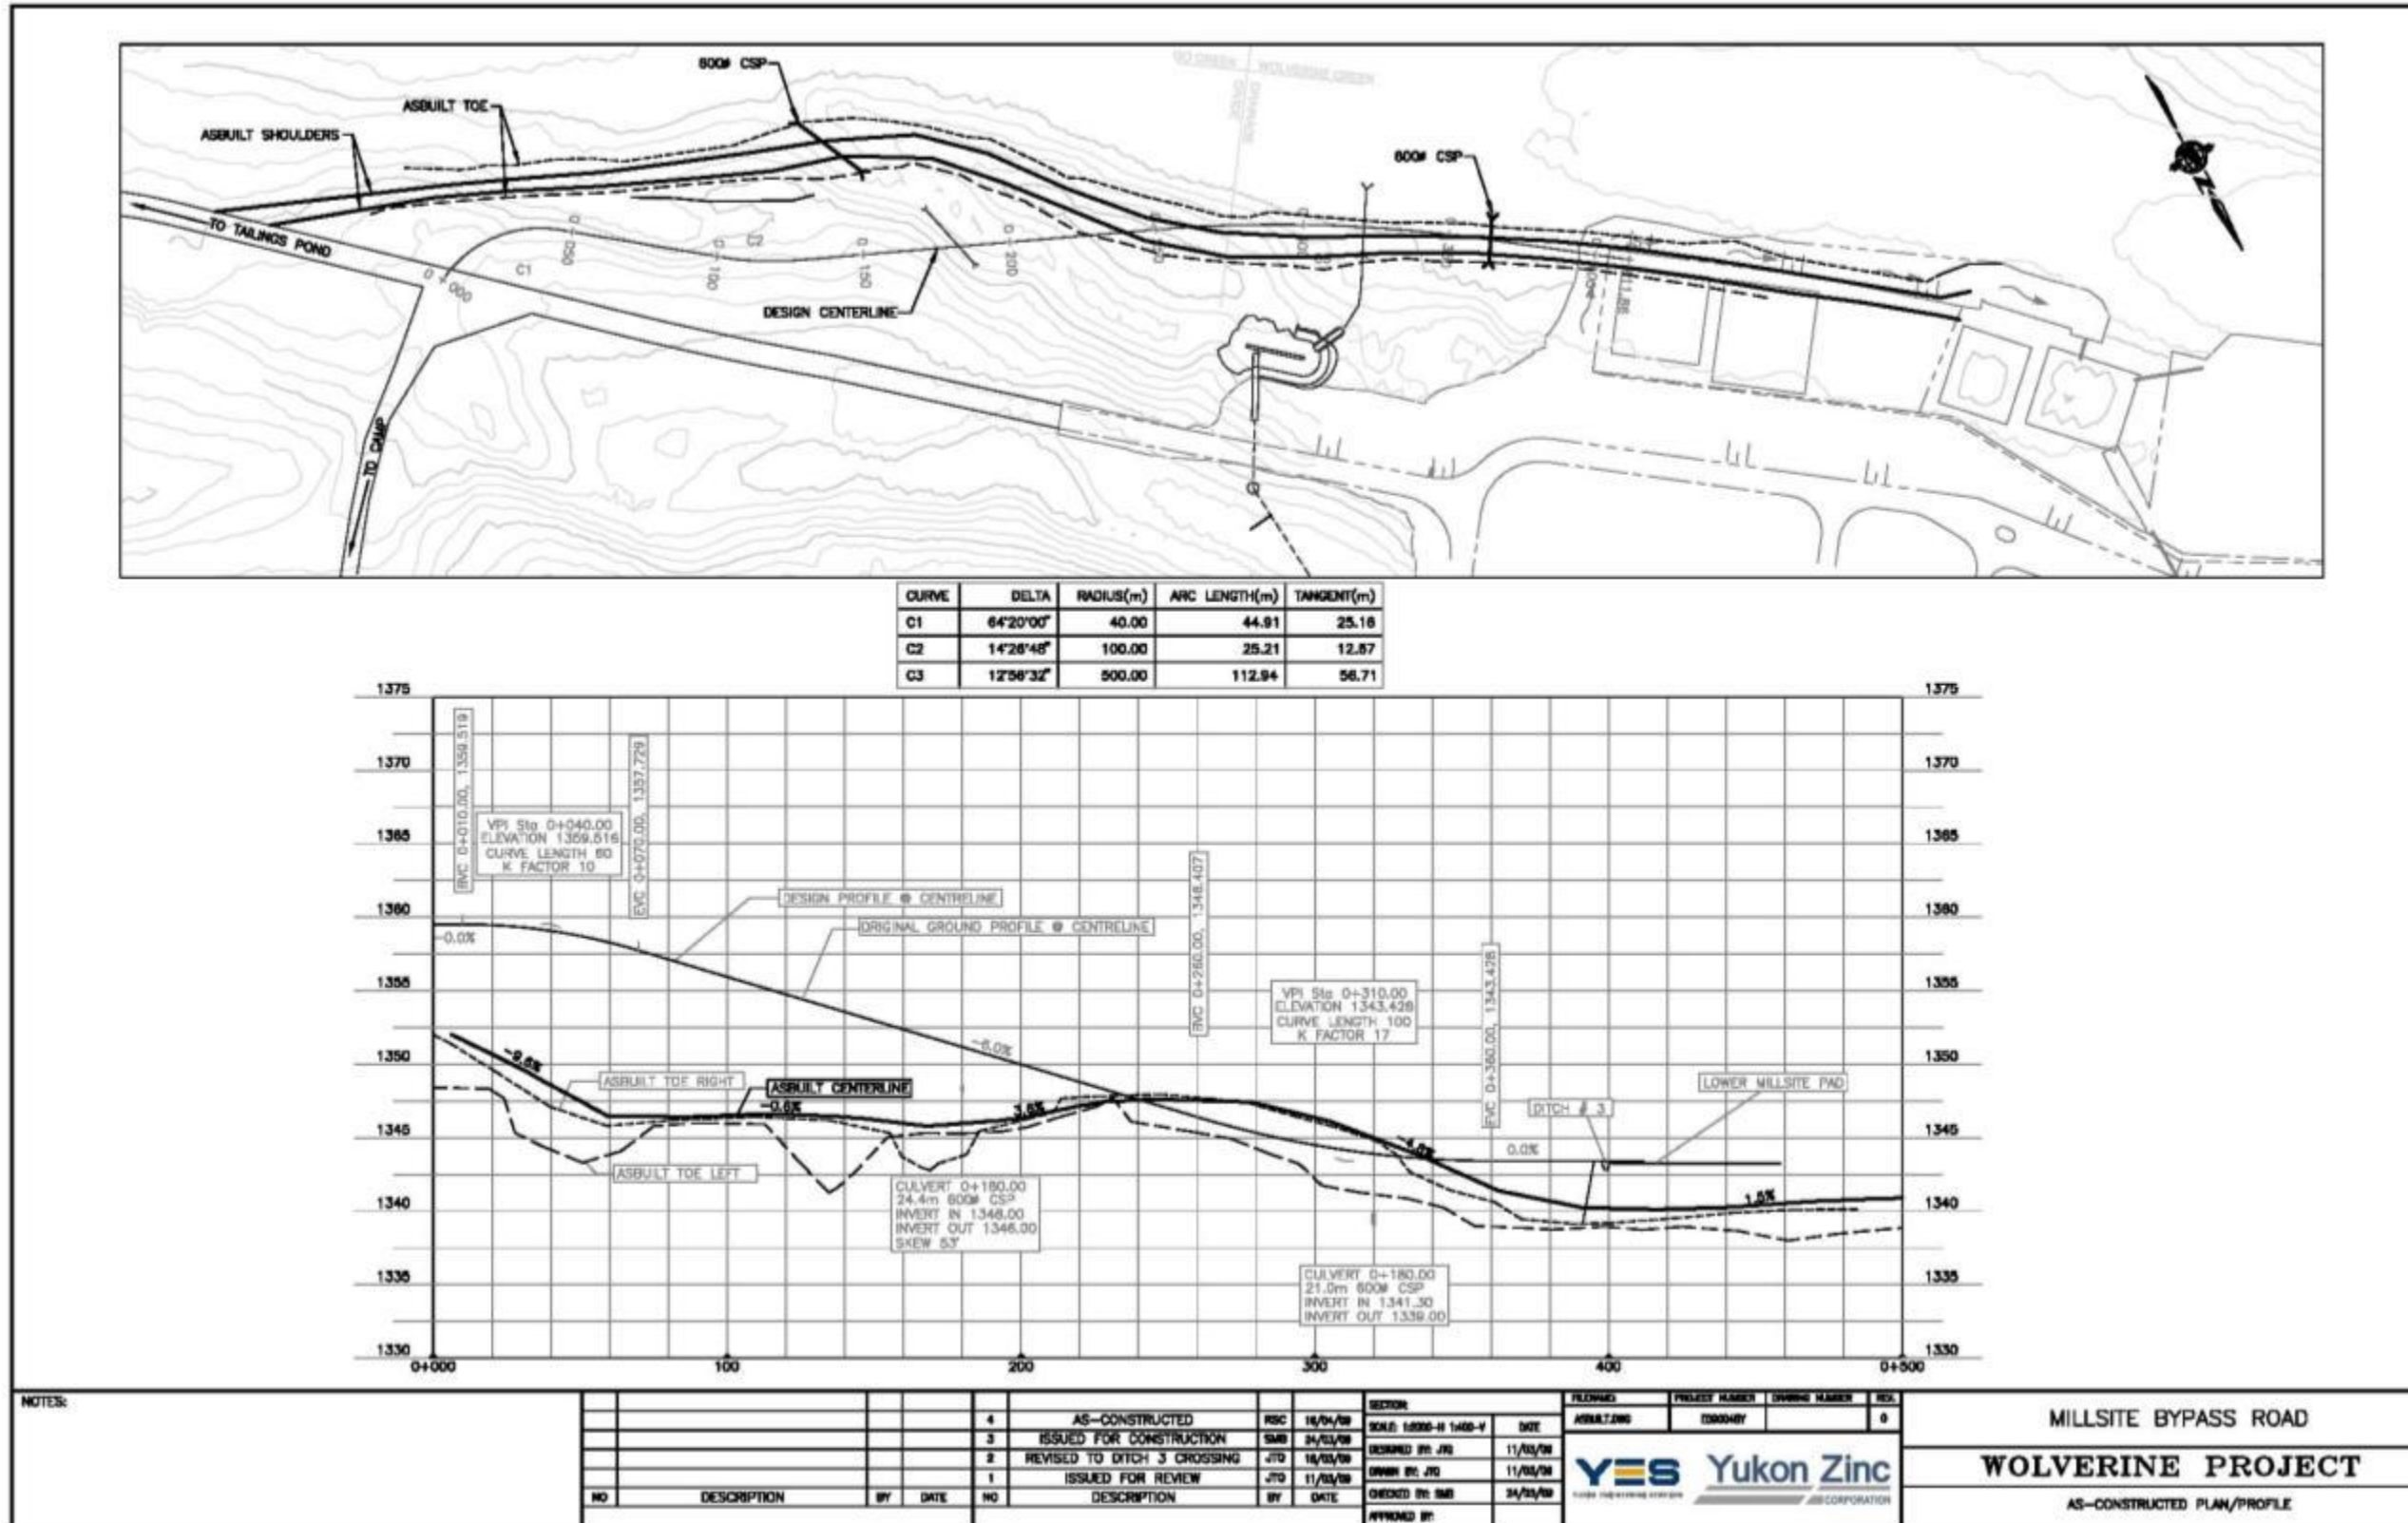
Mill Bypass Road As-built Drawing – Yukon Engineering Services
